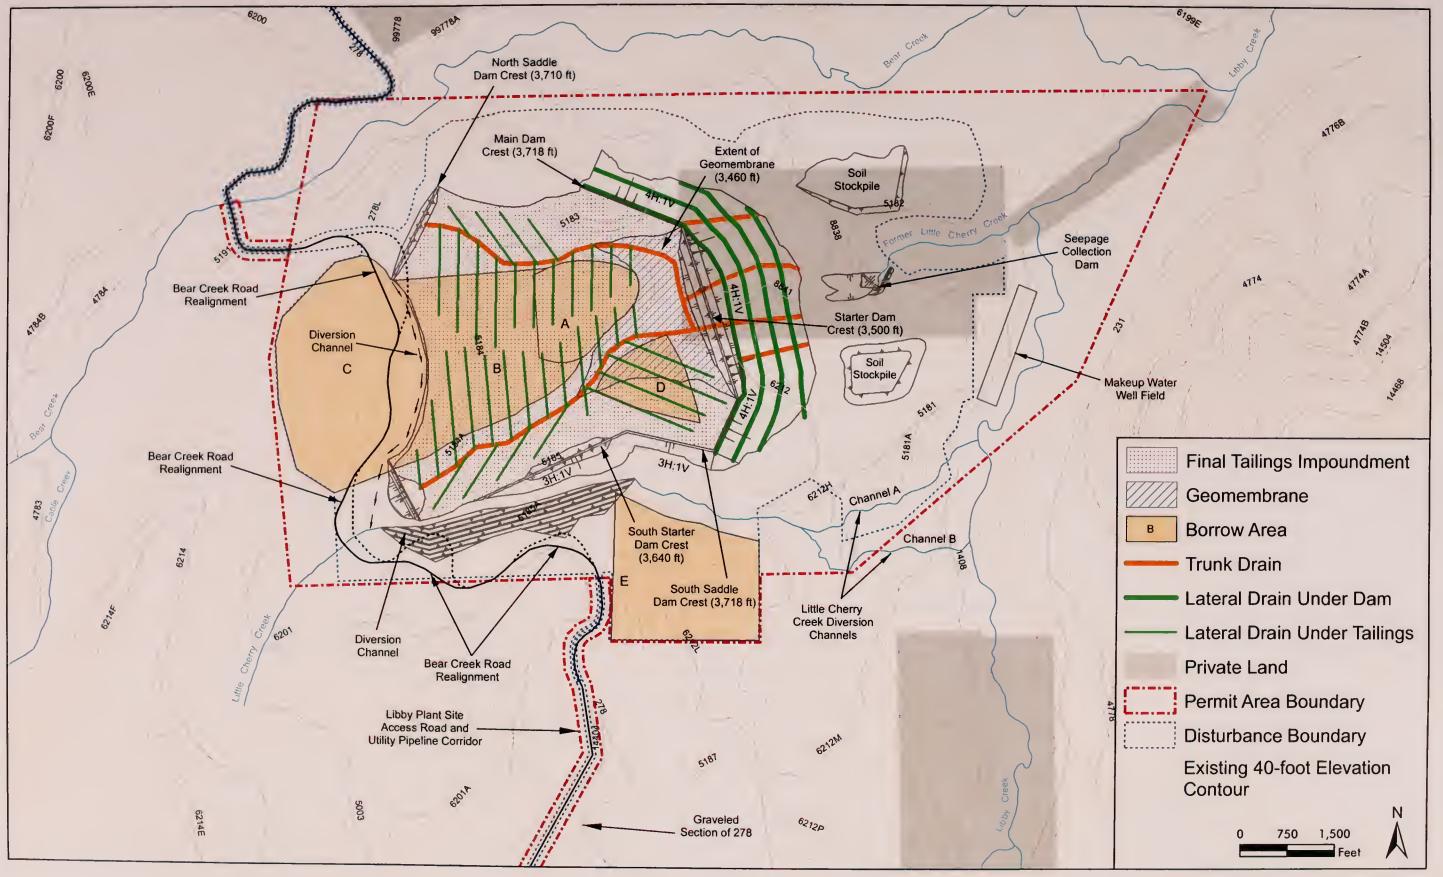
Little Cherry Creek Tailings Impoundment Site, Alternative 4
